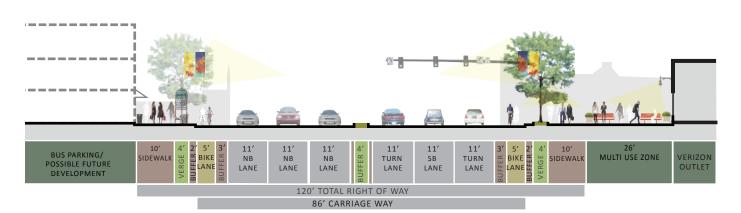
Section AA'Through Franklin Street Near Somerset St. Looking South
